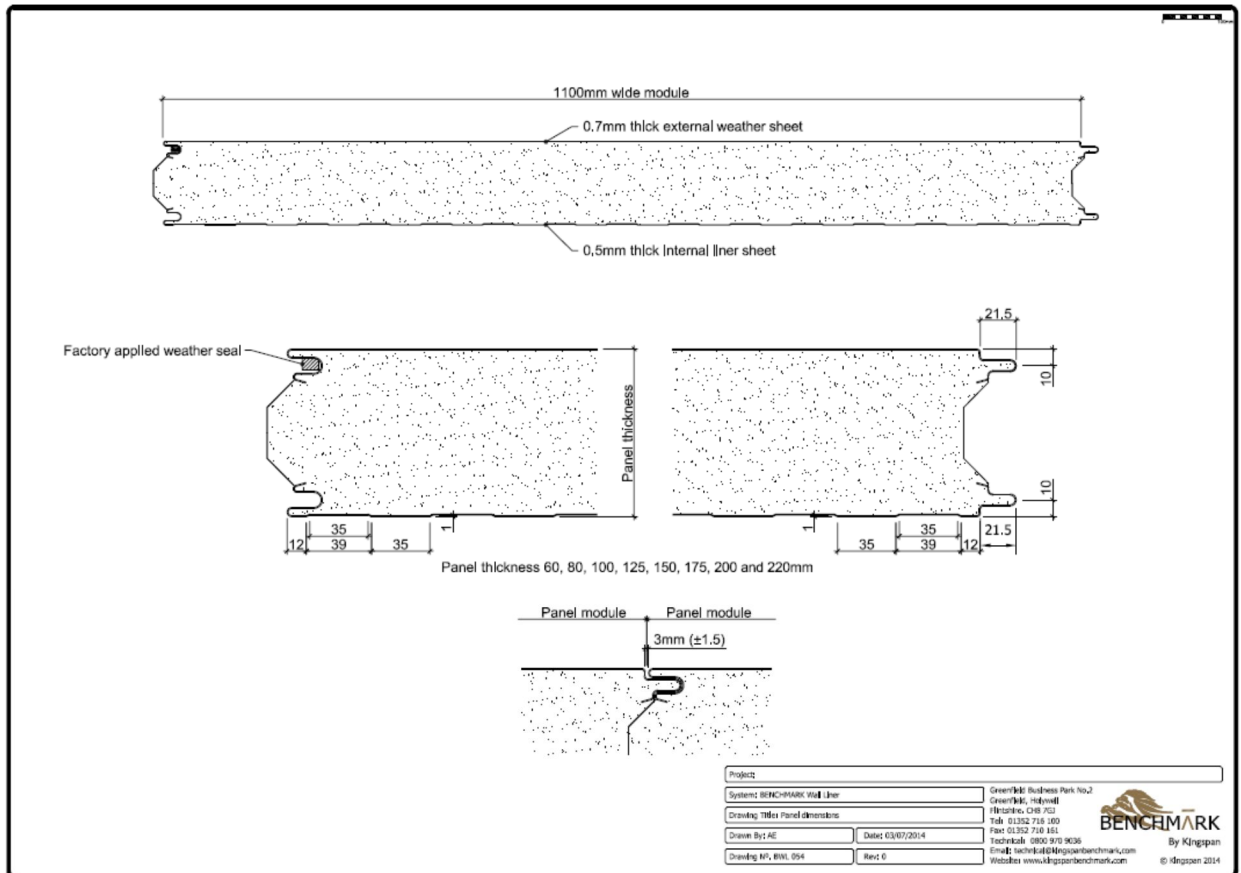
Construction of the System showing the key dimensions of the BENCHMARK wall liner panel.
